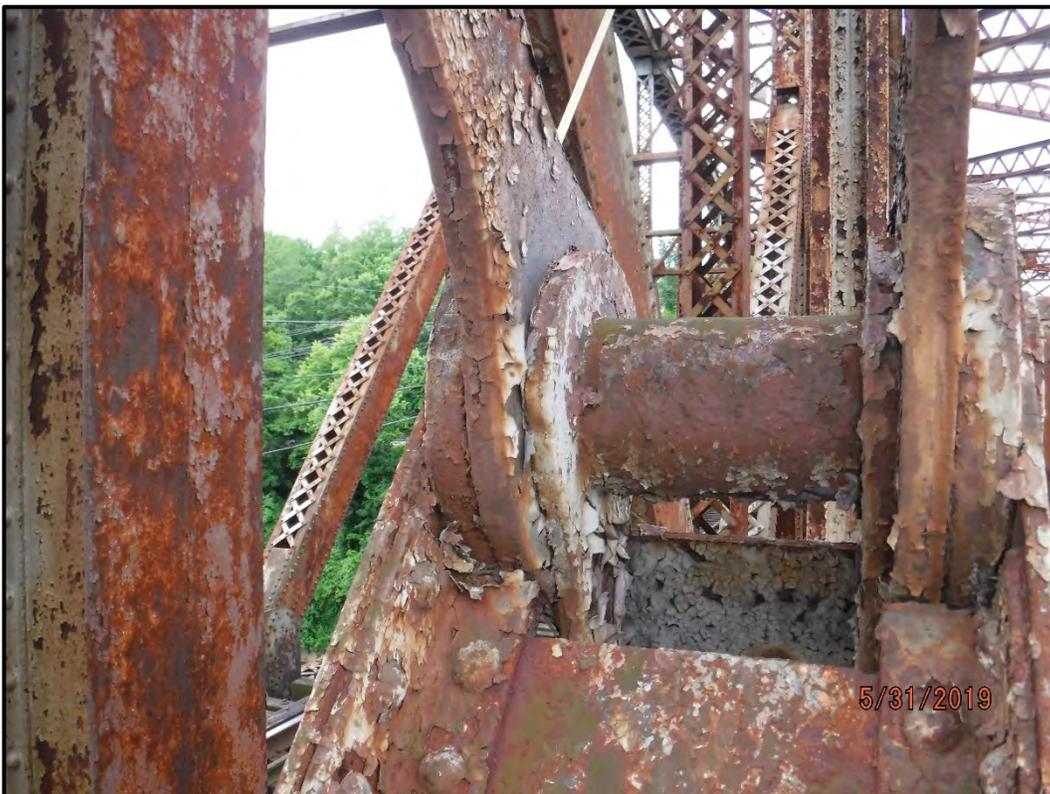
Eyebars at panel point M5 on the upstream truss have up to 1/16" deep pitting.
